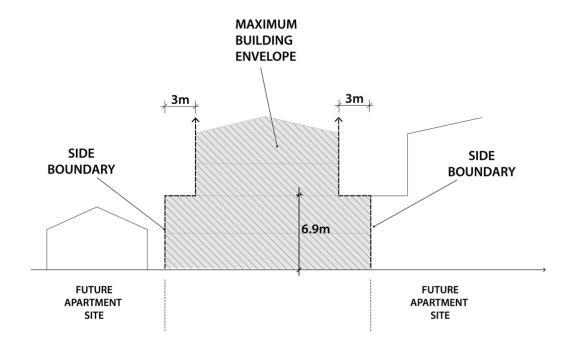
Garden Apartments Walls on Boundaries and Side Setbacks (elevation)
